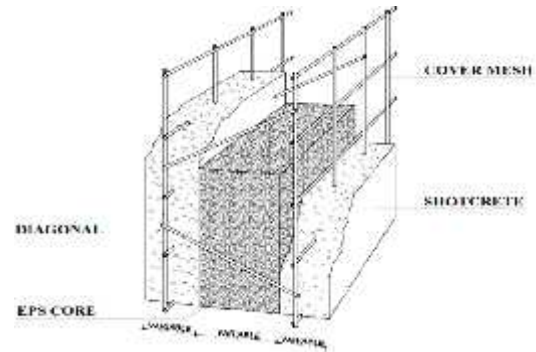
Isometric view of typical cross-section of RCSP sandwich panel
